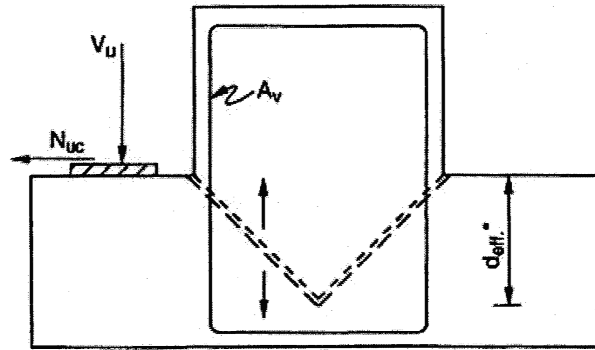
Corbel diagonal cracking and tension reinforcement (Caltrans, Bridge Design Aids, 1995)
